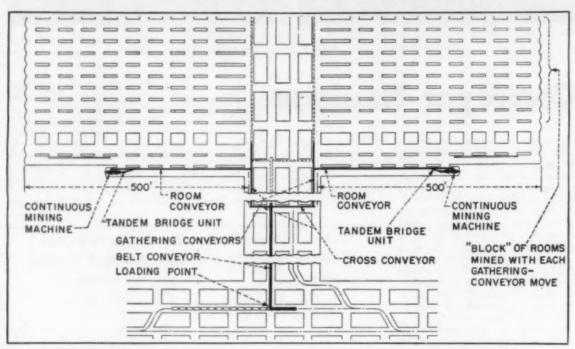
CONTINUOUS MINING with bridge-conveyor equipment—multiple production units and deeper rooms with a single loading point.
